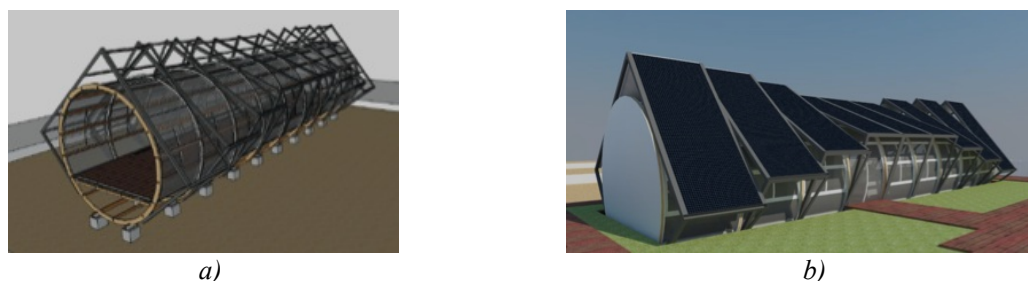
Technological adjustments: (a) the tube section forms the structural system of the house; (b) the final design.
